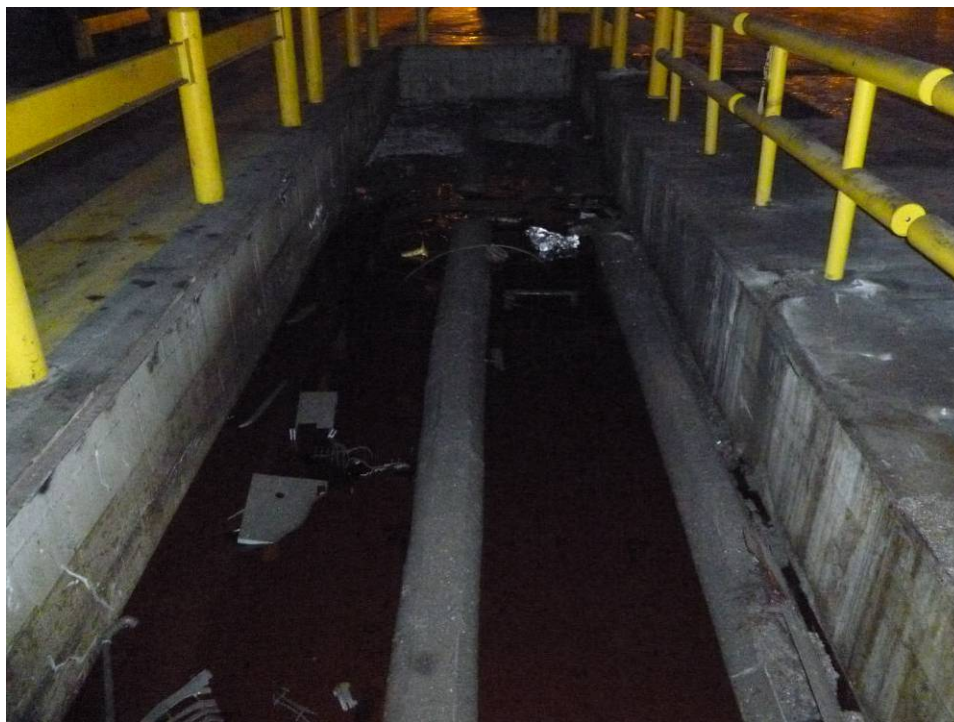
(AOI-39) Equipment Pit near Columns A15/A14. Photo taken facing south.
